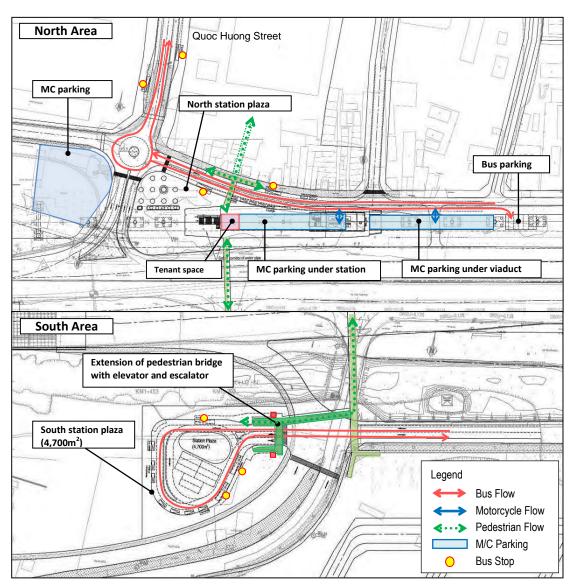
Concept Plan of the Thao Dien Station Area (upon UMRT opening)
